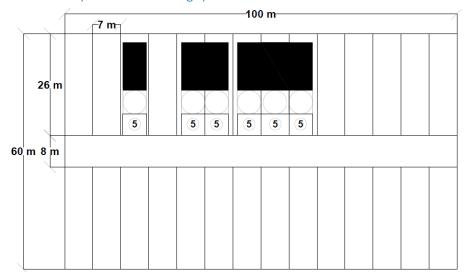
shows a larger family terrace 3+ bedroom typology with a rear access double garage. To encourage 2-bedroom terrace house the lot width should reduce to between 4.2m and 5m wide allowing for 2 upstairs bedrooms rooms front and back and a single garage of court or lane. If this configuration is used exclusively you achieve around 40 dwellings per hectare which pushes it into high density.
